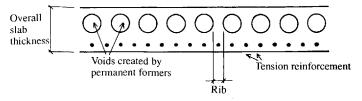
Cross-section through a hollow slab cast with permanent void formers
